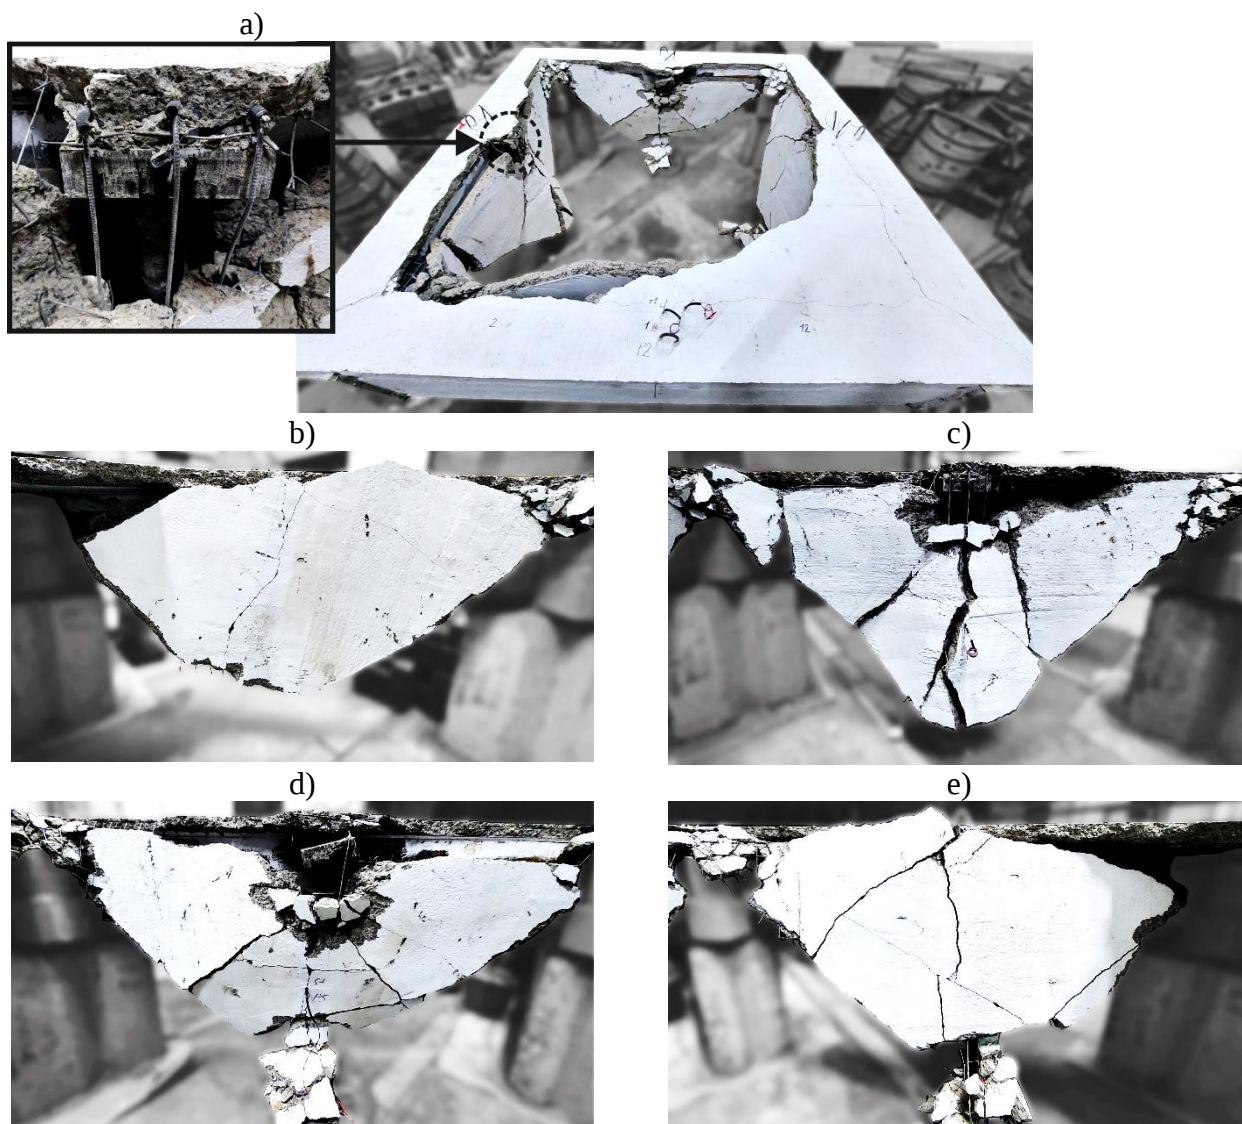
Specimen FS-1 after failure (a); slab segments in the region of column C1 (b); columns C2 (c); columns C3 (d); columns C4 (e)
